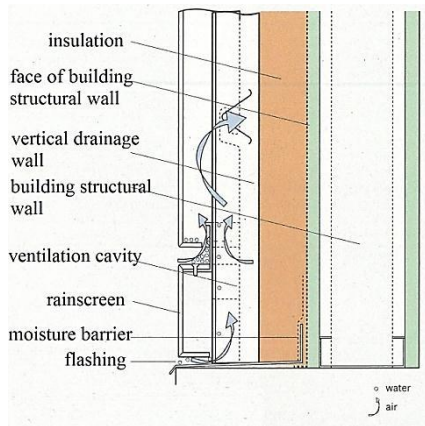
Vertical section through a typical horizontal joint detail in a drained and back-ventilated metal rainscreen (Robert and Guariento, 2009).
